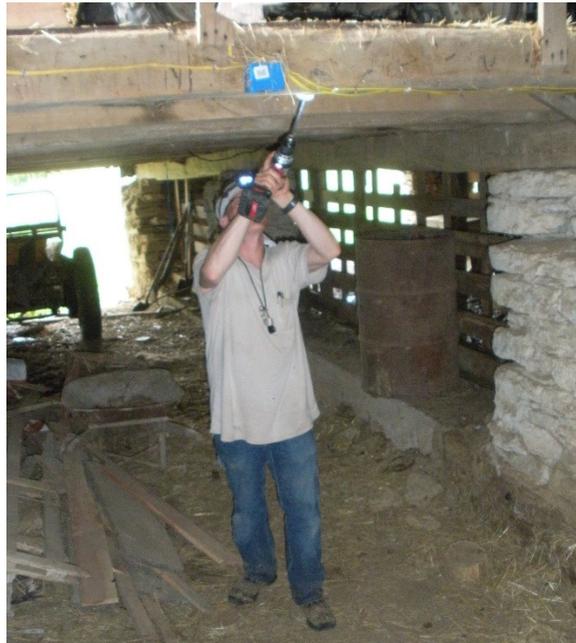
Anderson barn interior showing timber construction typical to hay press barns: stone foundation, horizontal sill with a shiplap connection, and a vertical post. Photo courtesy of Christopher Baas.
